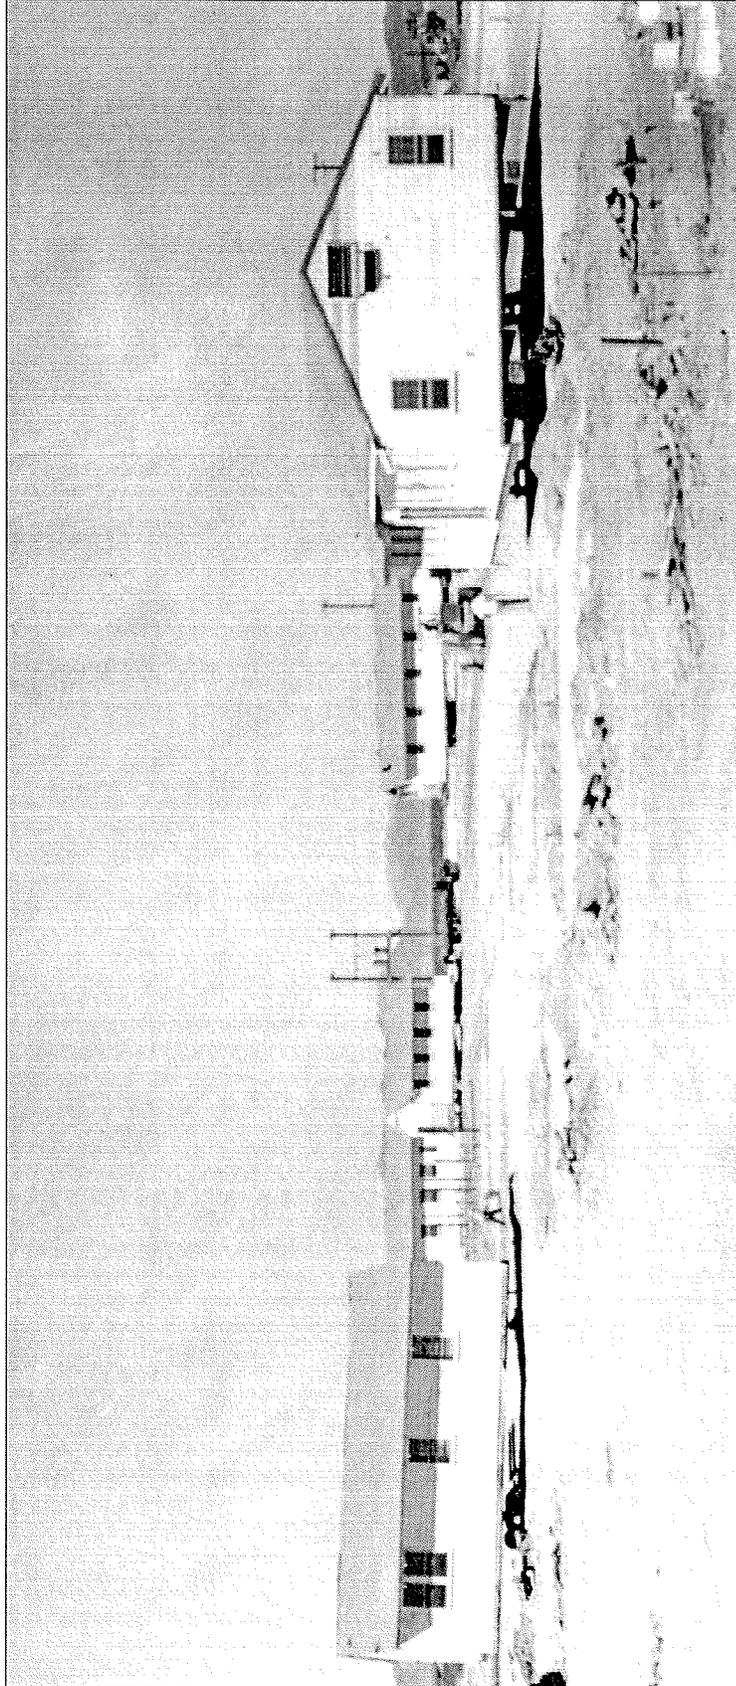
View to west across camp showing sectionalized barracks moved into place, September 22, 1950. Concrete foundations and piers (foreground) are designed to support the floor joists (photograph courtesy of Reclamation).
